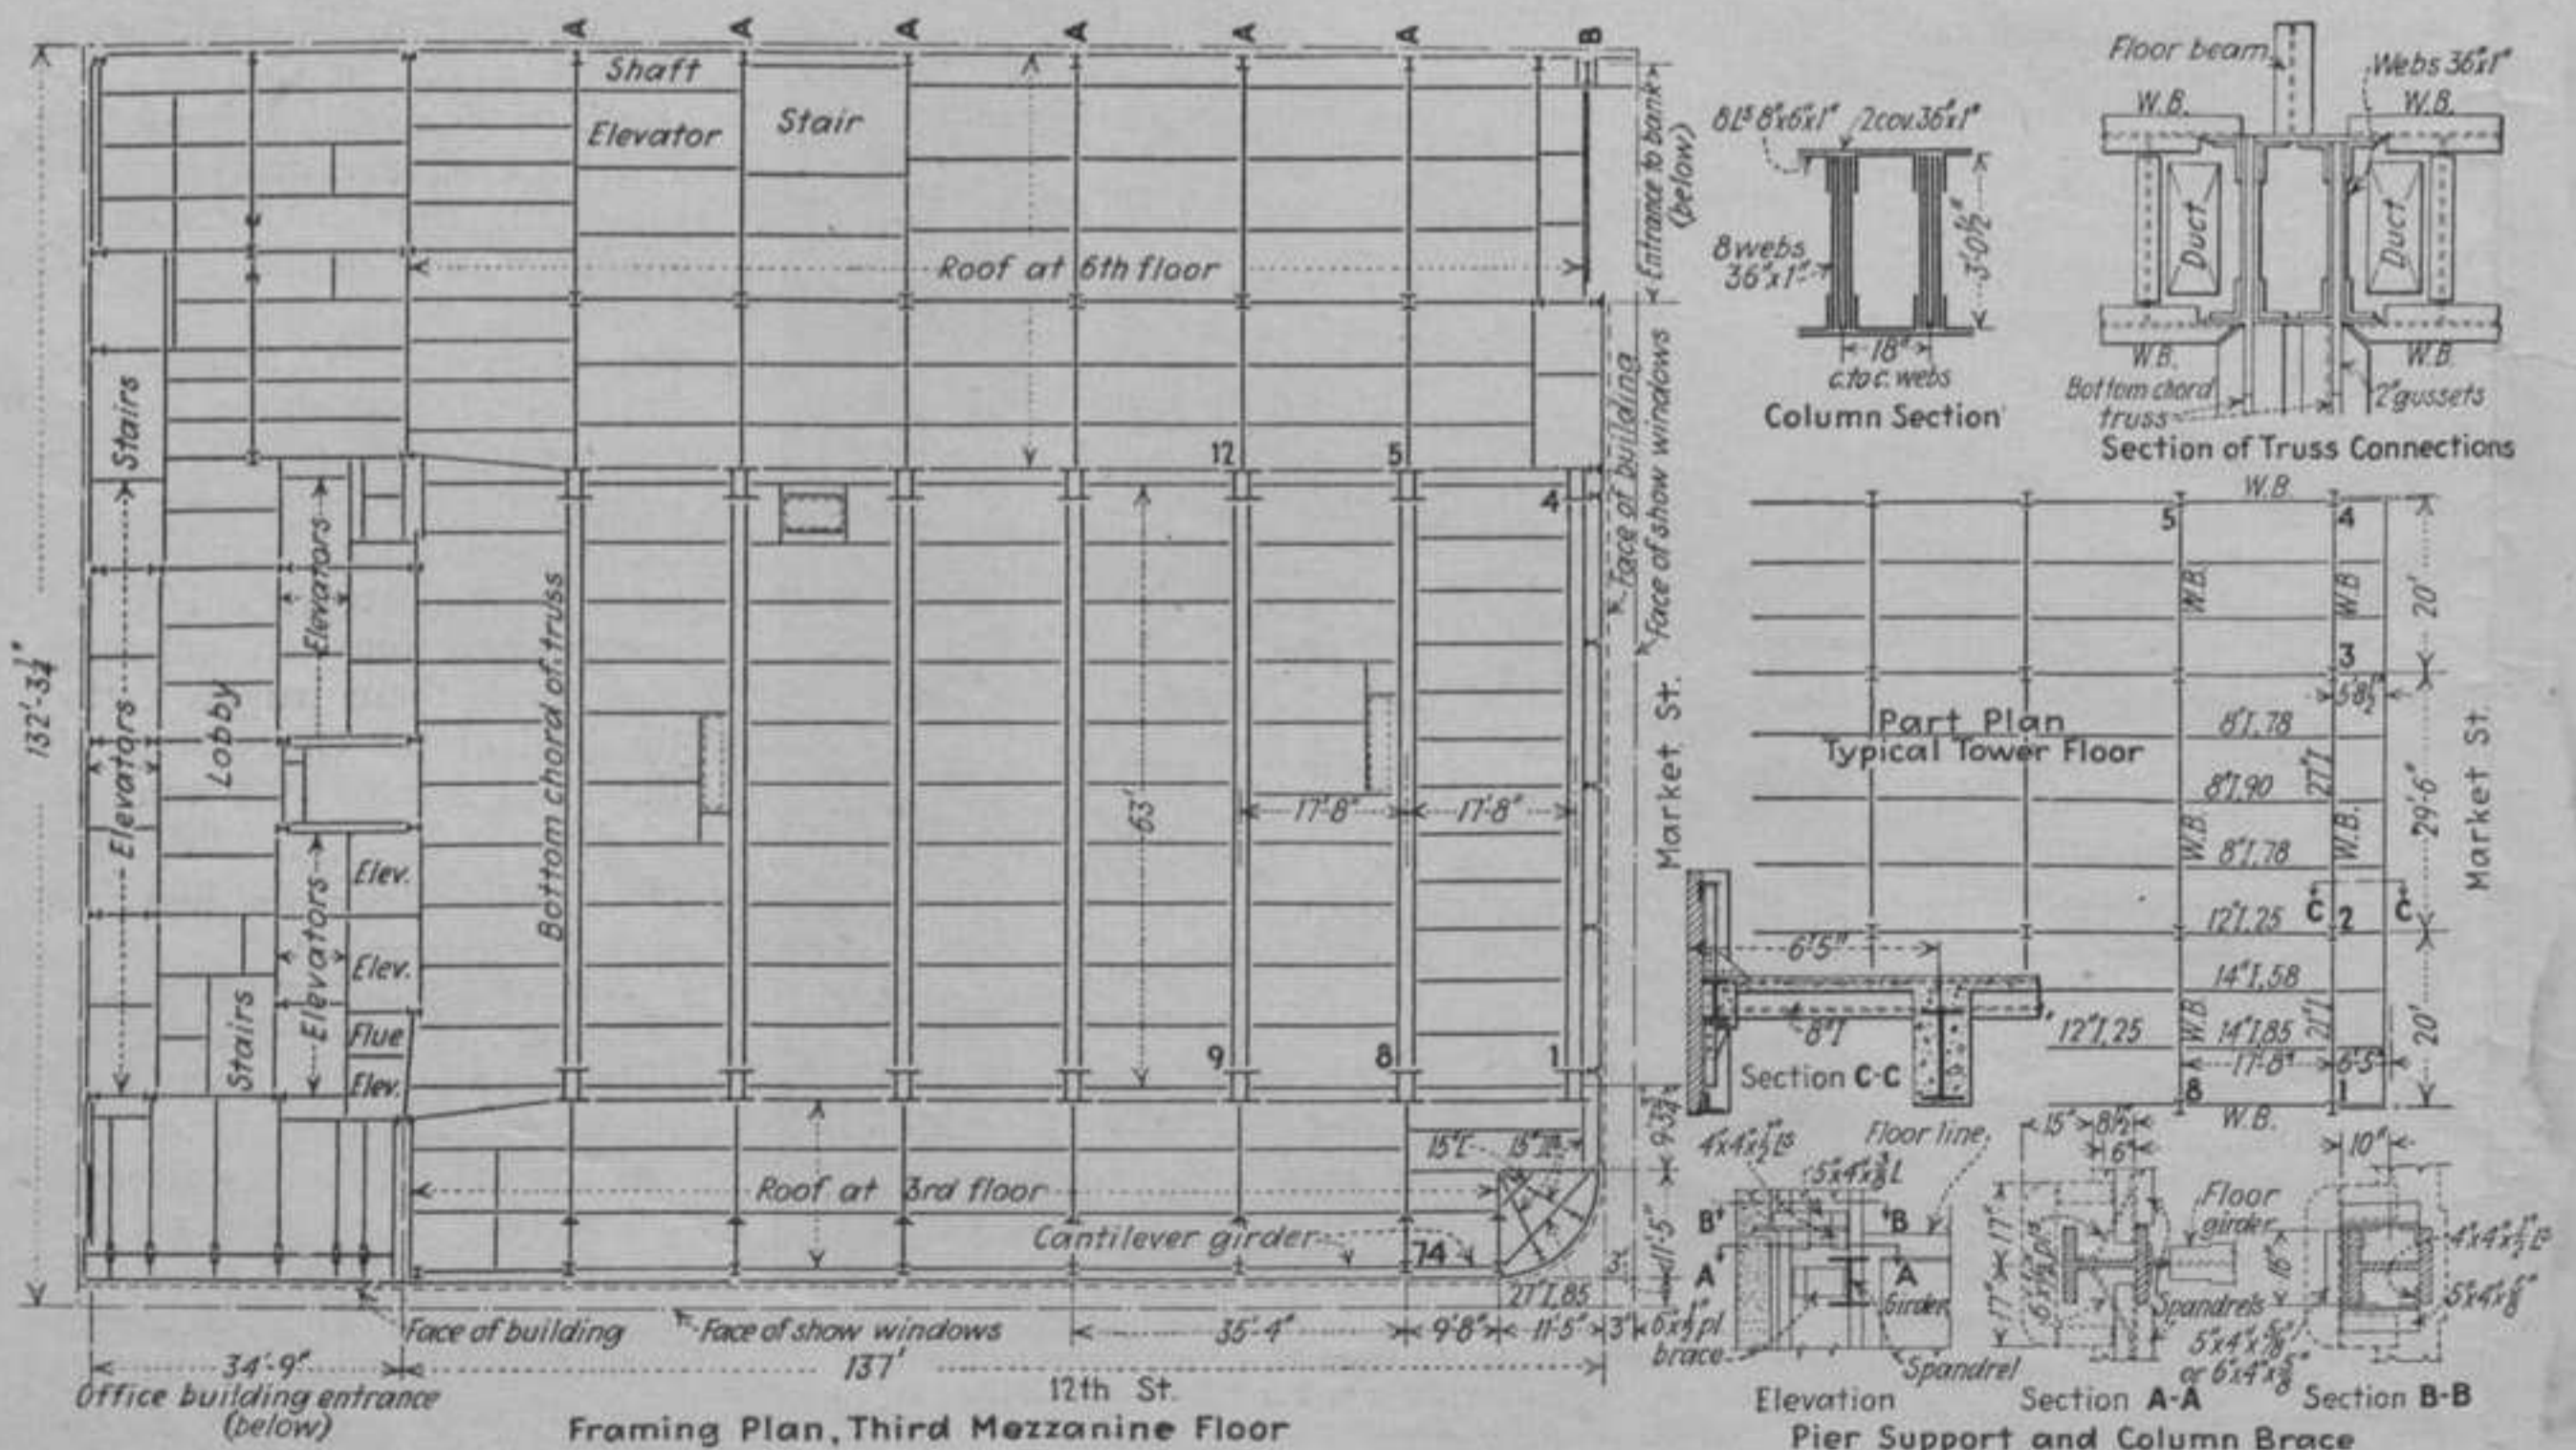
Truss-framed bents designed as rigid frames carry 30 upper stories of building over banking room 60x130 ft. on the second floor. Truss gussets are milled to bear on web plates of supporting columns and on base billets of columns carried above.
